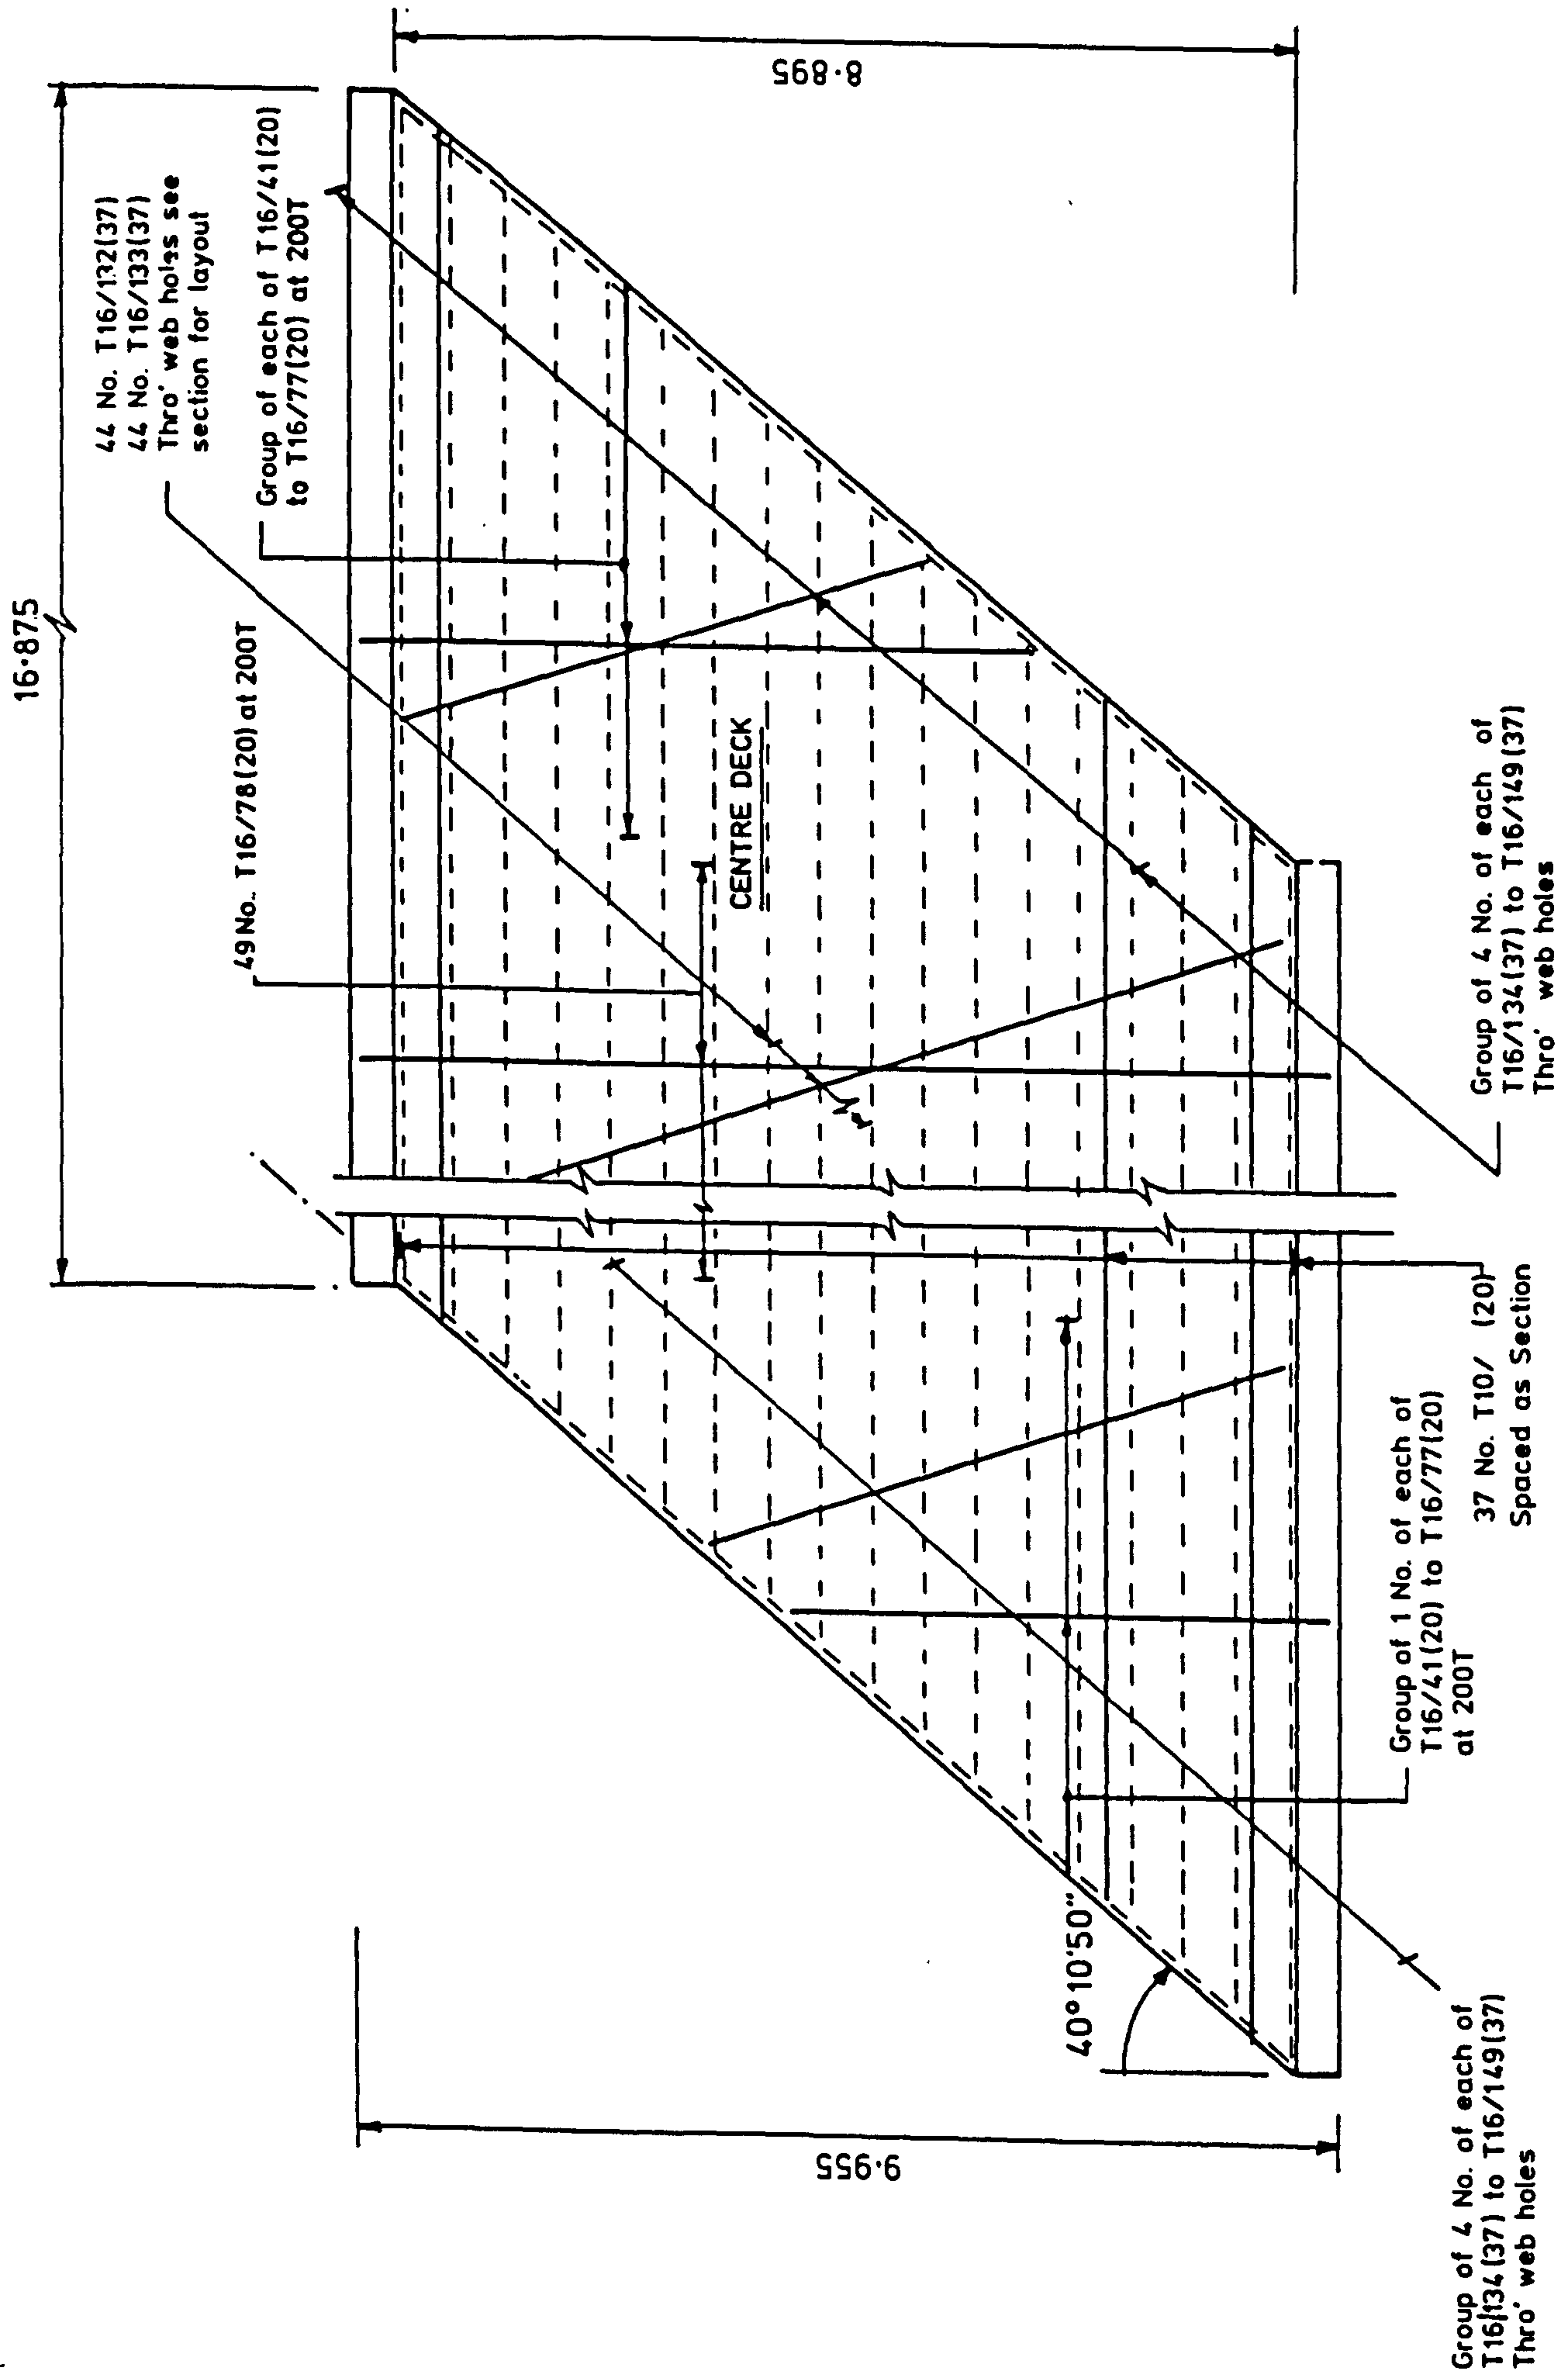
REINFORCEMENT LAYOUT FOR FULL SIZE DECK 2
